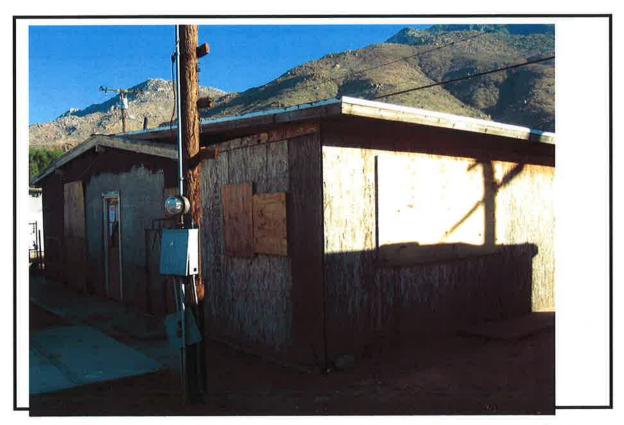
DATE: 01/08/08 TAKEN BY: A Green#69 NOTES: EXPOSED WALLS N.O.D.# 13
